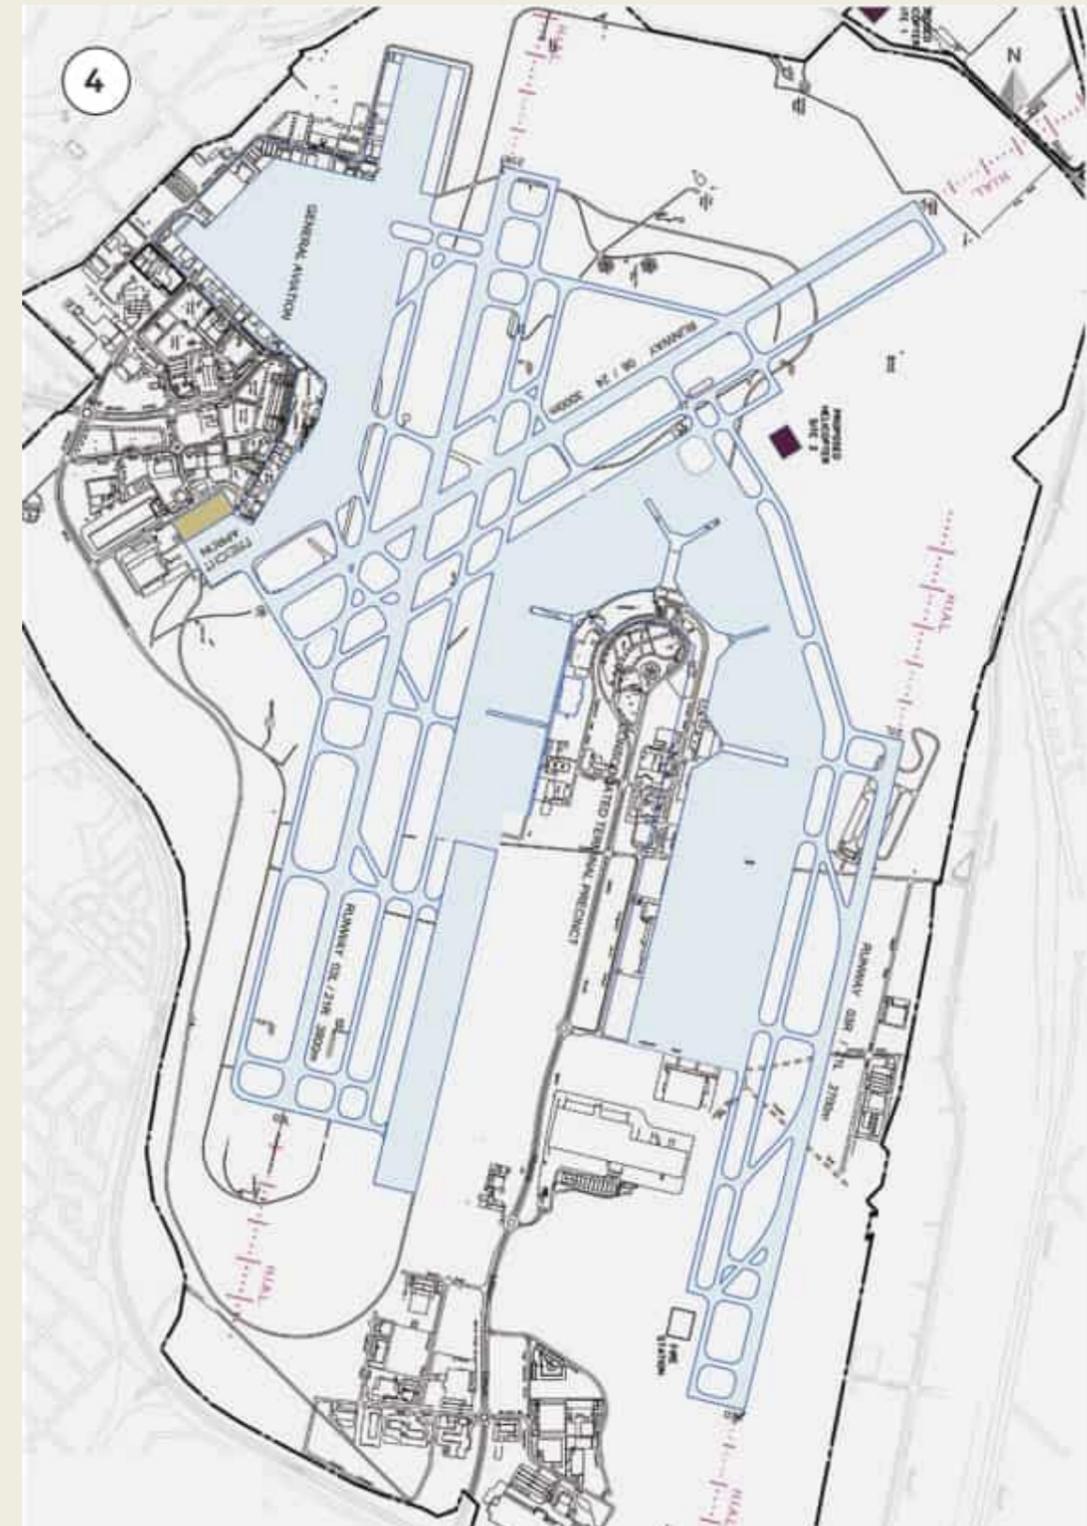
Perth Airport Airfield Layout Master Plan 2009
